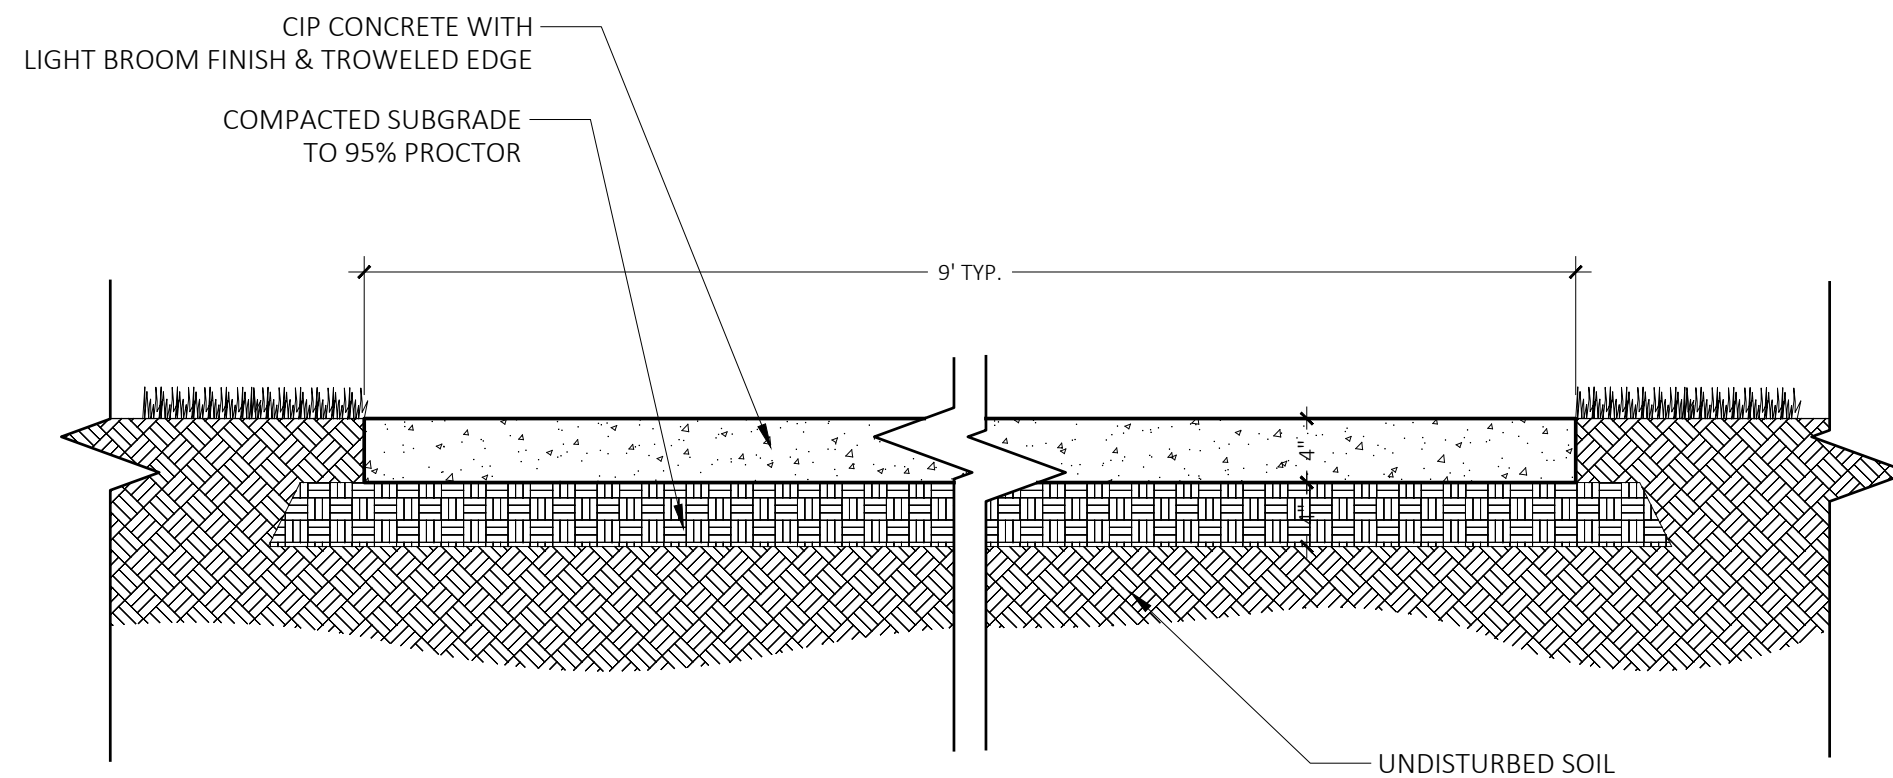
DETAILS 'C' - CHAPEL PAVING PLANS AND SECTIONS
